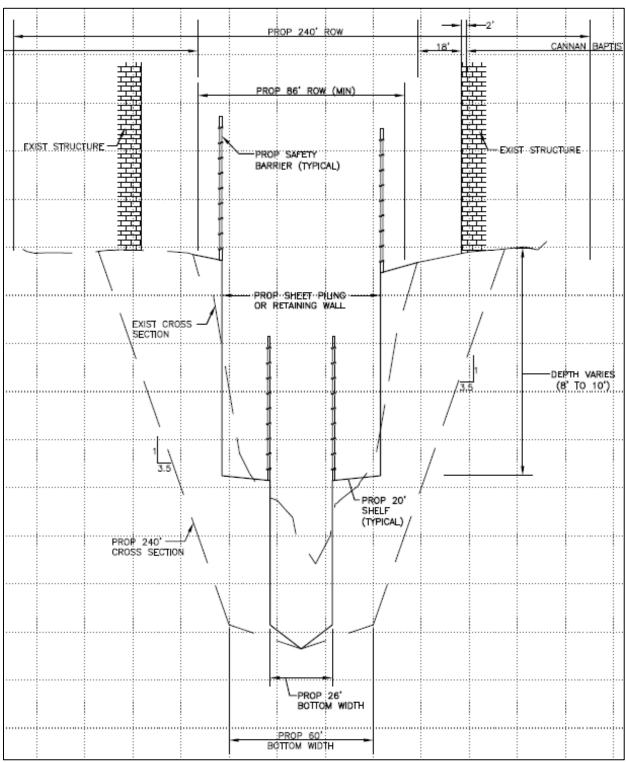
Proposed Lockwood Alternate Cross Section (86-ft ROW)
